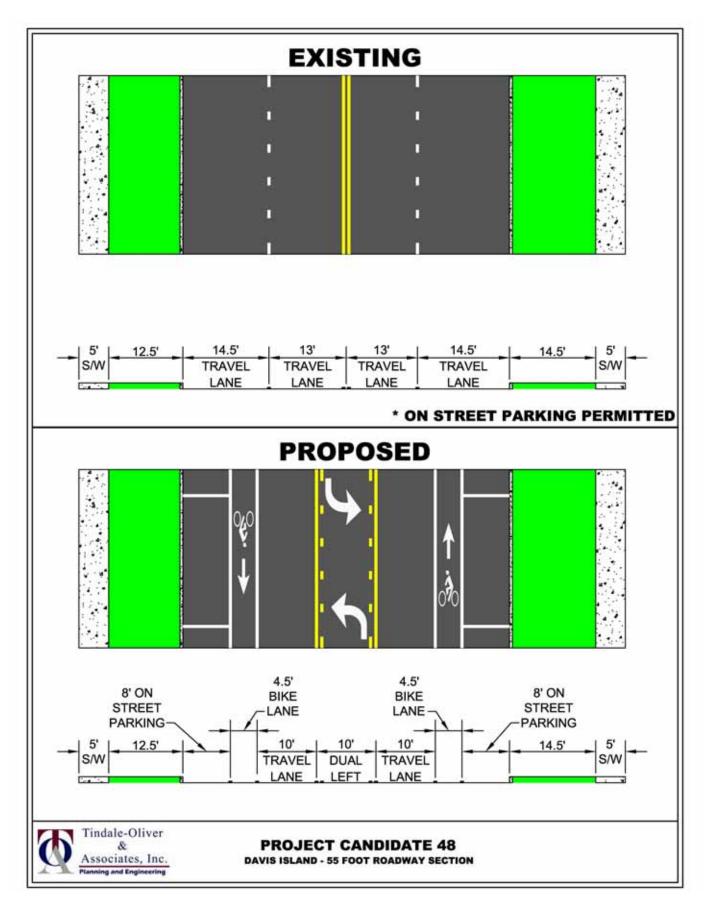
C: Davis Island Proposed Improvements – 55-foot Roadway Section
